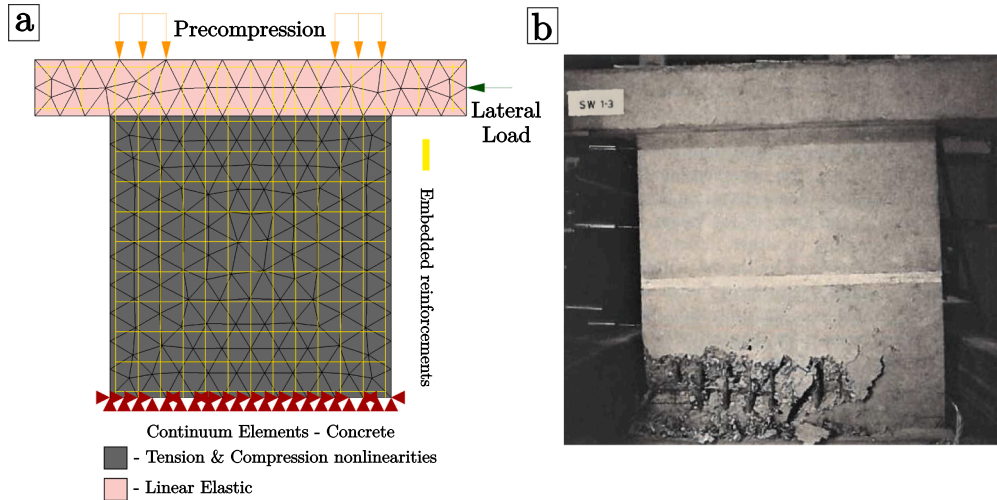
(a) FE Model of the RC shear wall test (reinforcements in yellow) and (b) the final failure pattern of the experiment [30].
